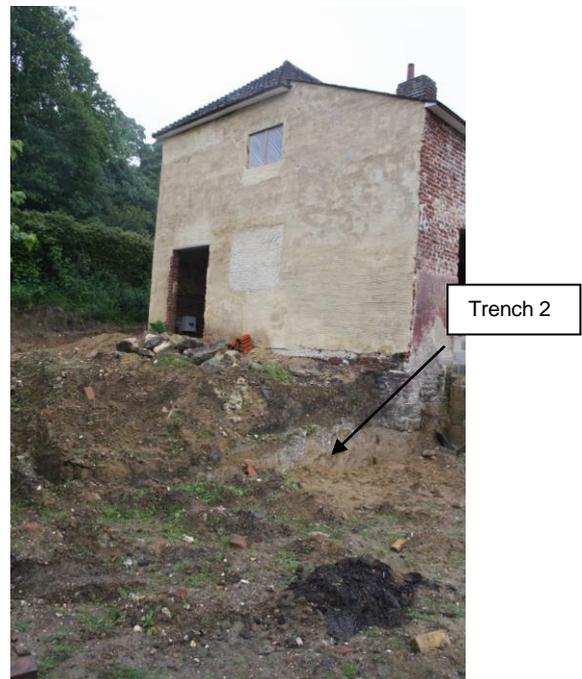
and 8. Groundworks already excavated at the east end of the house (shot facing east)
